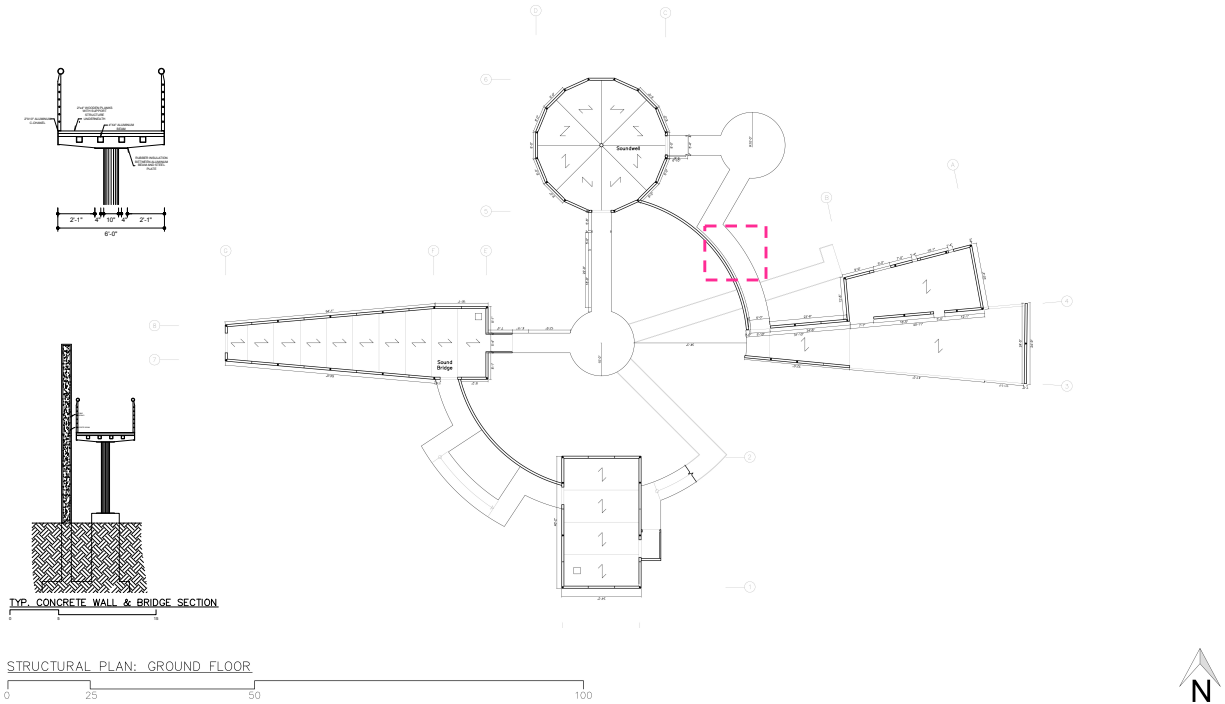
Structural Ground Floor Plan & Typ. Concrete & wall Section. Diagram by student Reinaldo E. Hernandez Arcena.
